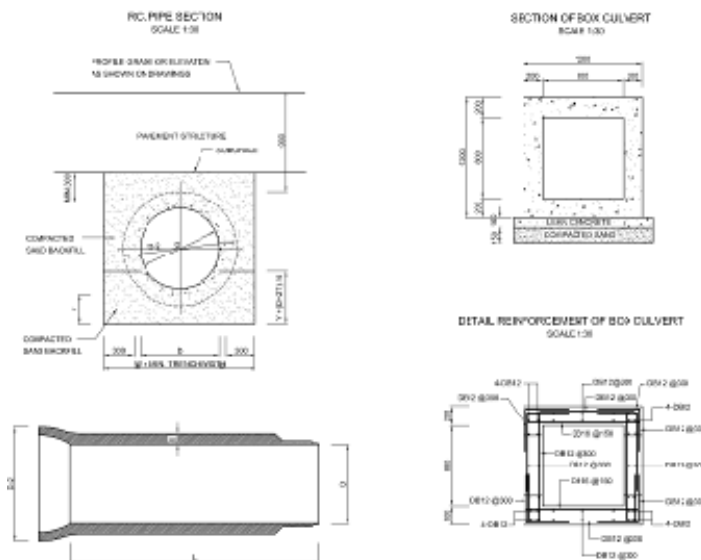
Typical section of R.C. Pipe Culvert and R.C. Box Culvert
